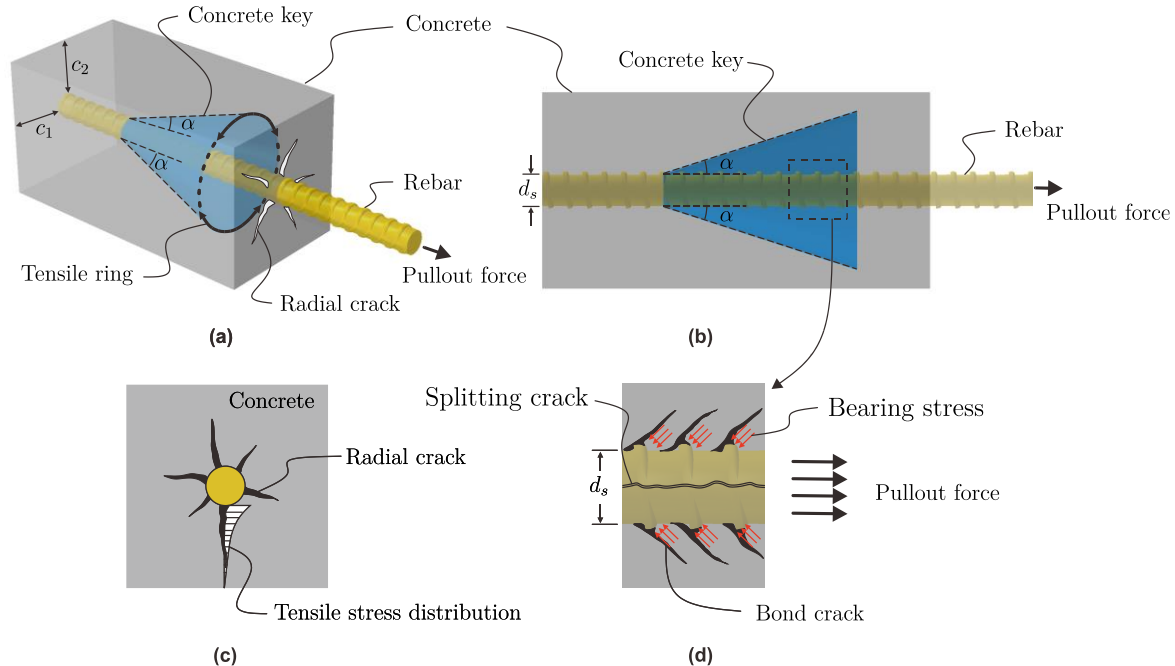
Tepfer's theory of bond in an anchored bar: (a) 3D representation of bond mechanism (radial cracking), (b) longitudinal section view (pull-out force), (c) cross-section of the splitting crack formation, and (d) shear and frictional resistance mechanism of the crack (bond cracking).
